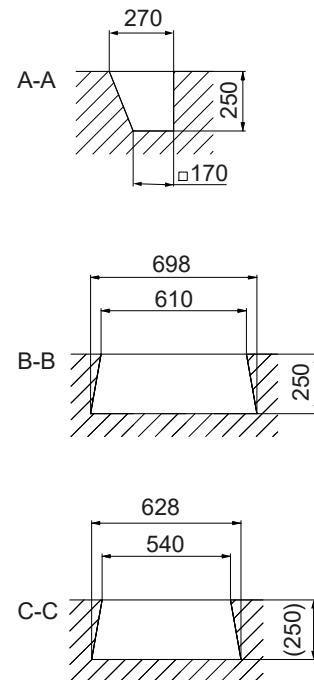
Foundation dimensions: Omega V, vertical installation, DP
